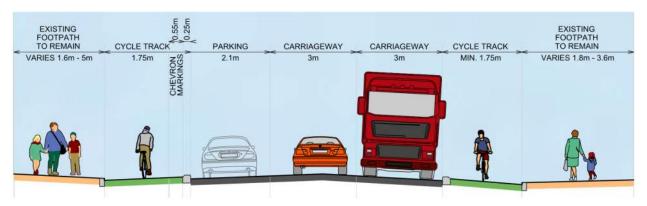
Typical Section 5 Option A Cross Section Henry St - Standard Cycle Tracks
